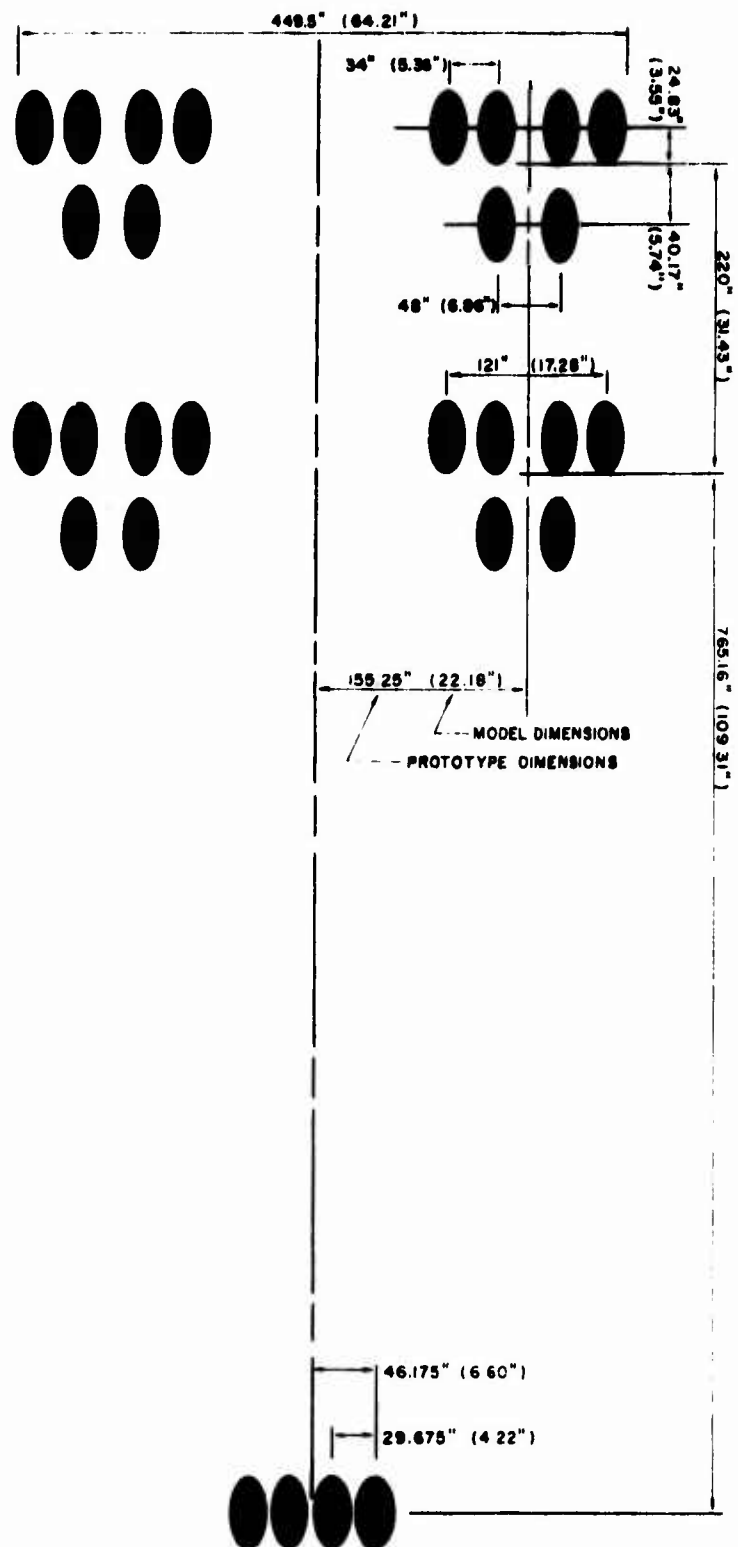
Footprint of C-5A Aircraft, Model and Prototype.
